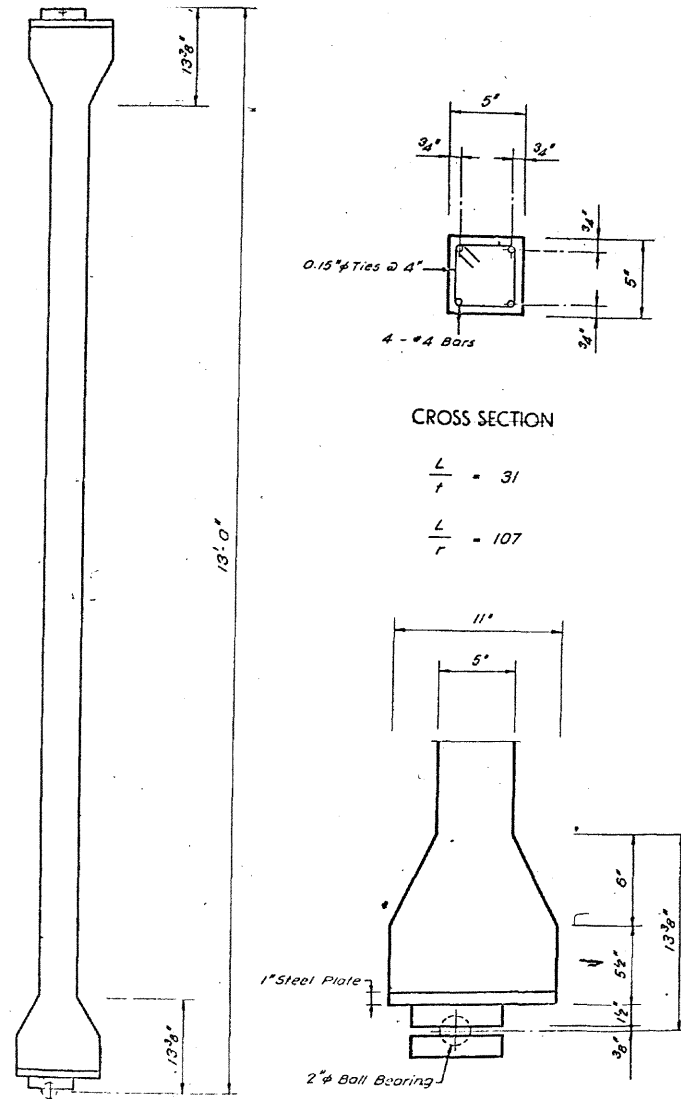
Column Details of Specimens in Drysdale et al.'s Experiment (Drysdale, 1967)
